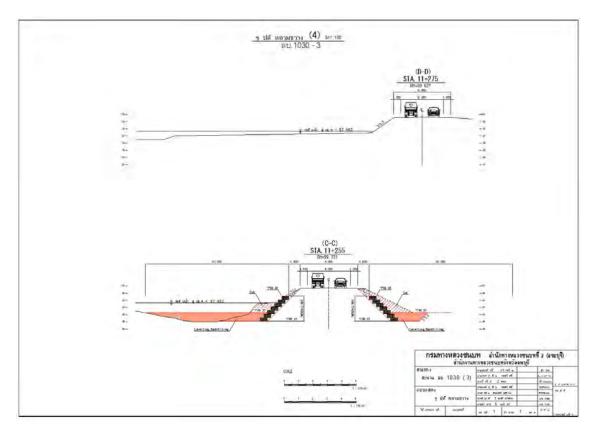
Design drawing of rehabilitation plan (Bridge1030-3)
